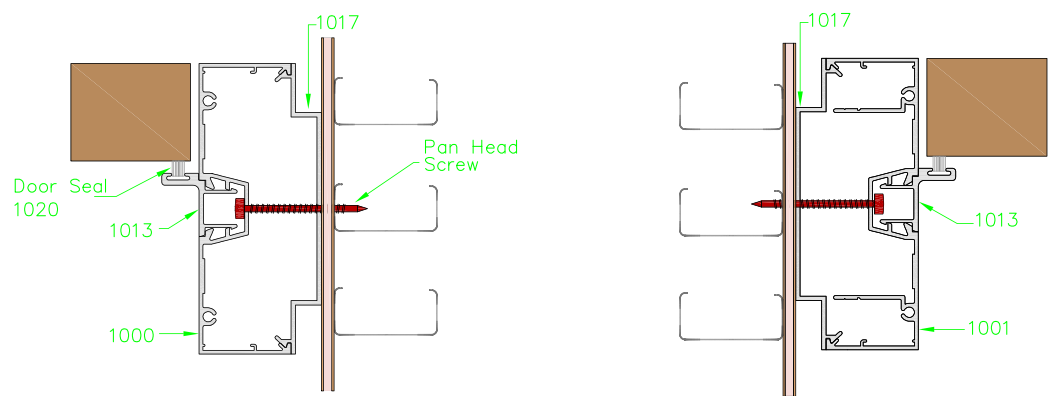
| Vertical Section Drawing of SM64 Shadowmax Detail at Ceiling
